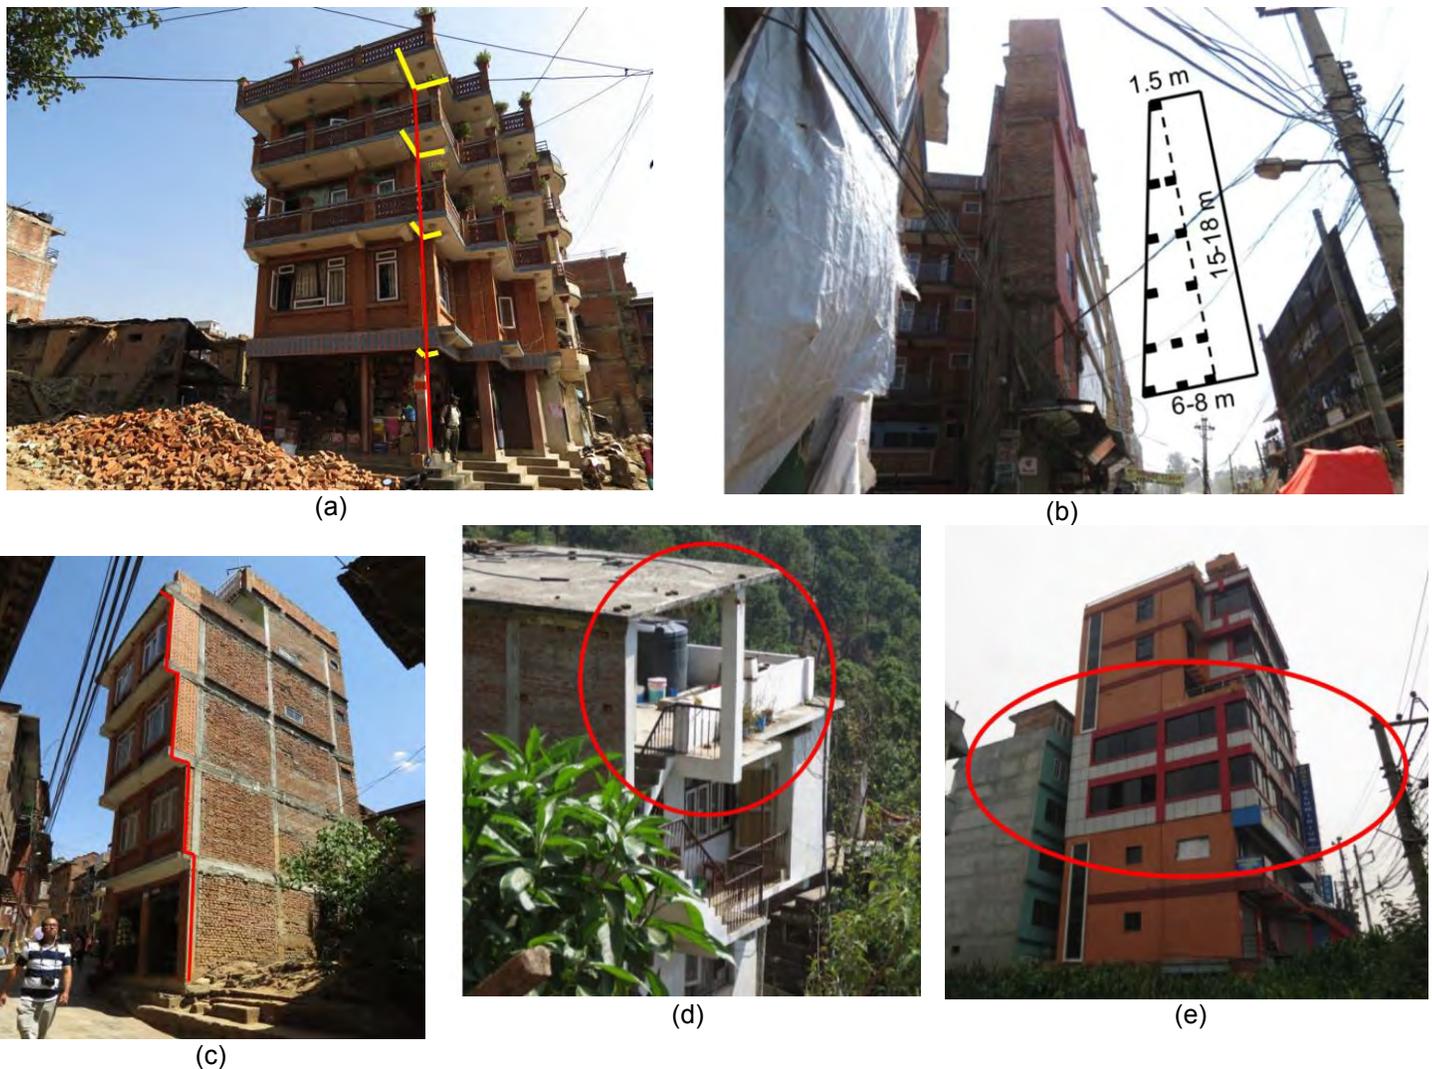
Different types of geometric irregularities observed in RC frame buildings with masonry infills: (a) large overhangs in both directions at building in Sankhu, (b) trapezoidal plan building in Balaju, (c) large overhangs in one direction at building in Dhulikhel, (d) floating columns at a building in Chautara, and (e) soft story buildings in Lokanthali (photos and annotations: Hemant Kaushik).
